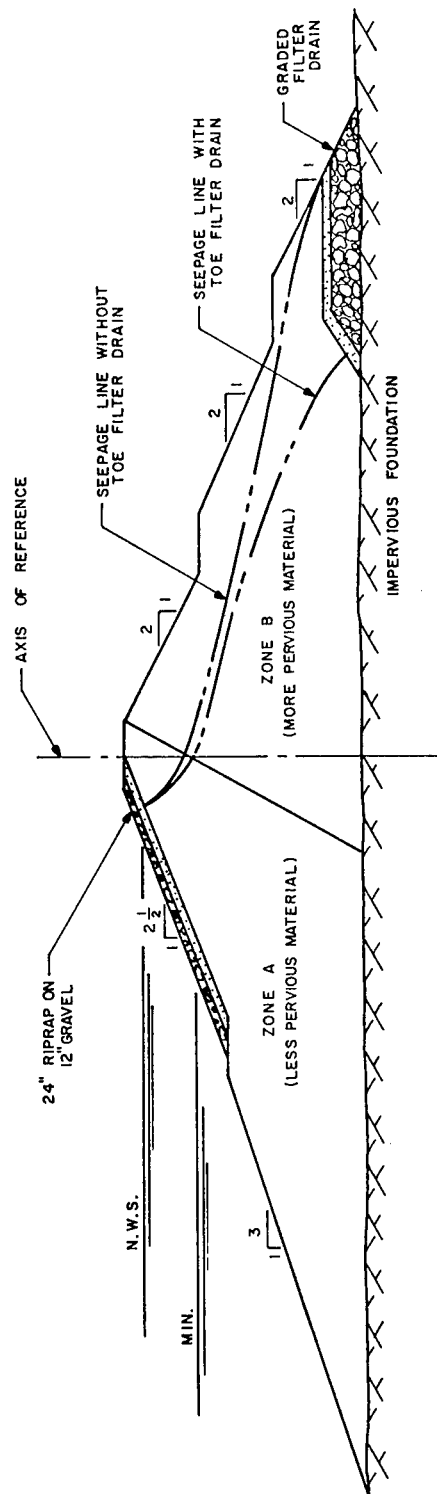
Typical Section of a Rolled Earth-fill Dam Built with Zoned Materials
